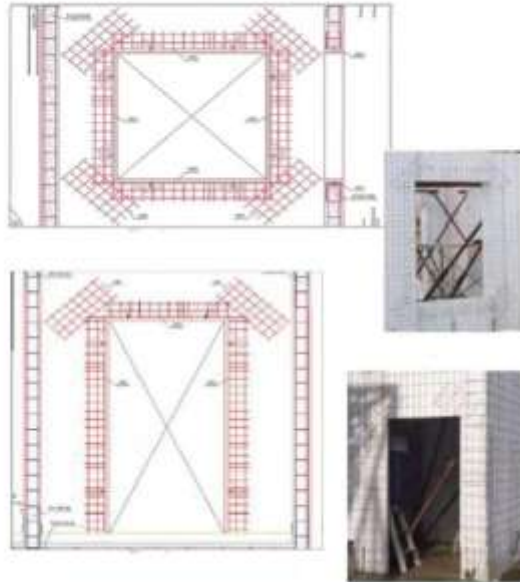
Image Showing Doors and windows details in EPS core panel system
